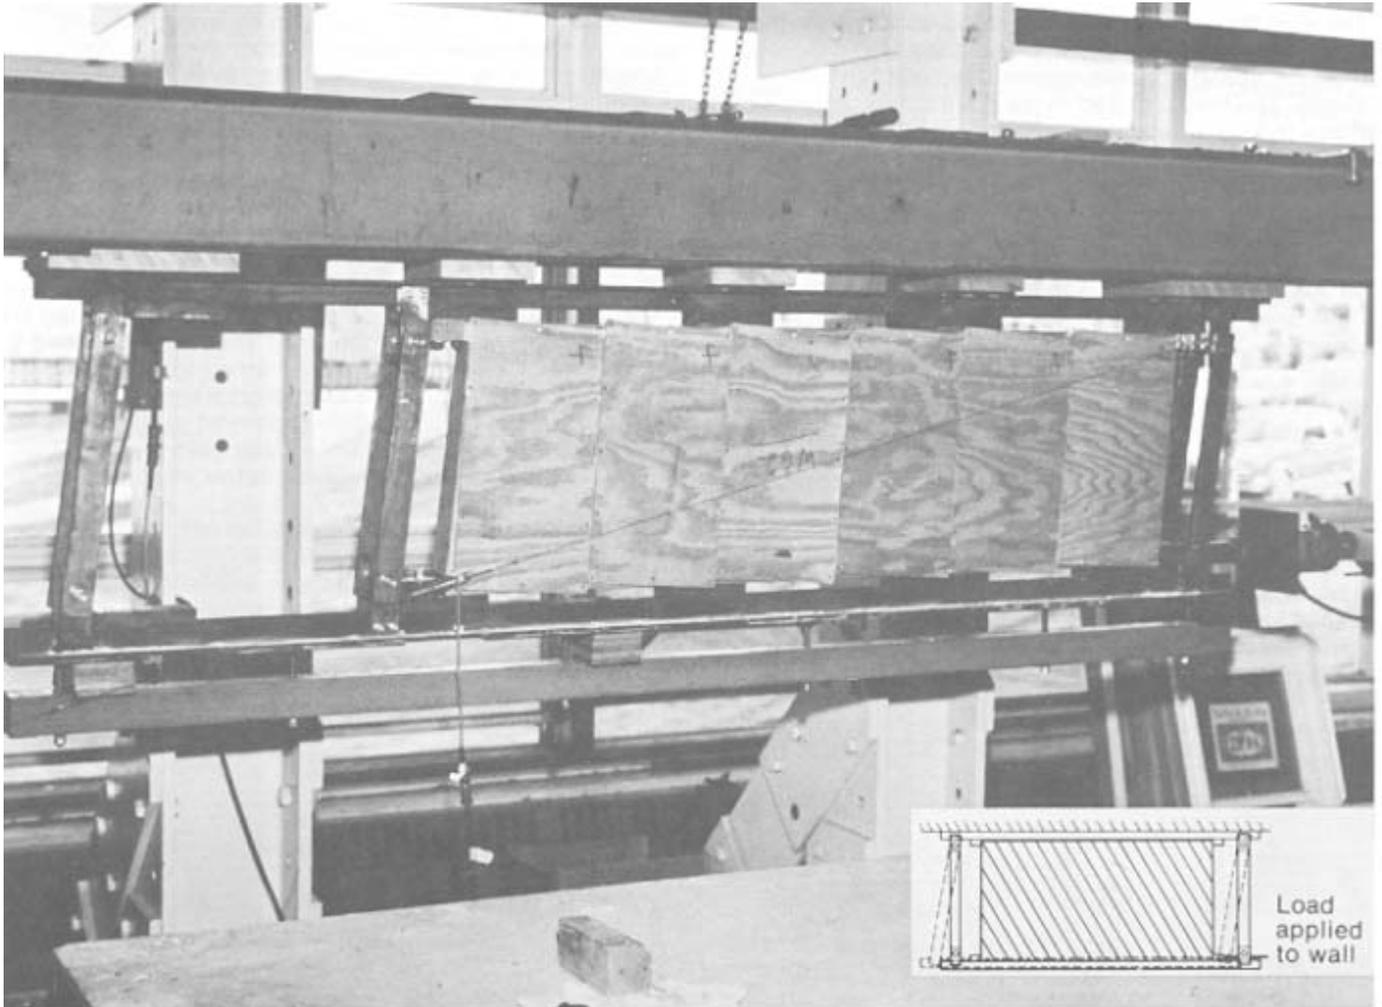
Test apparatus for wall racking tests. Test panel is 2 feet high by 6 feet long. Racking load is applied at lower right corner of frame. (M153003-11)
